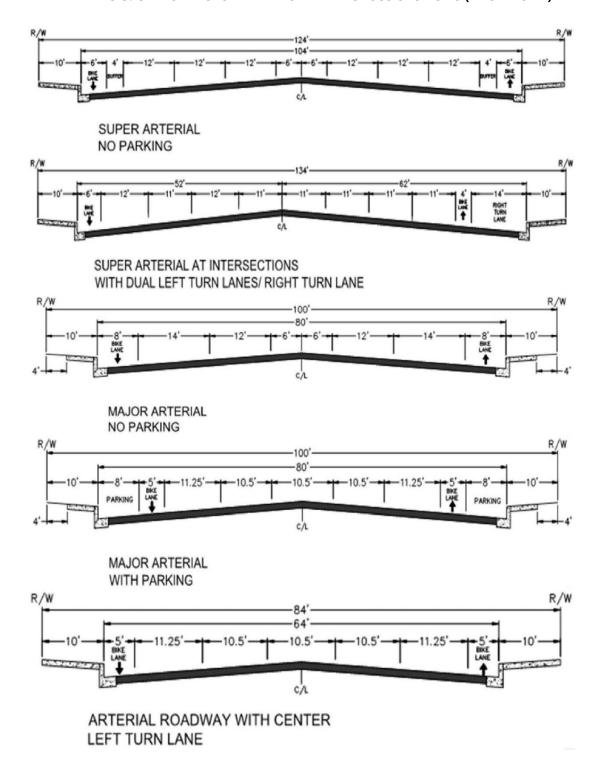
CITY OF VICTORVILLE ROADWAY CROSS-SECTIONS (PAGE 2 OF 2)
